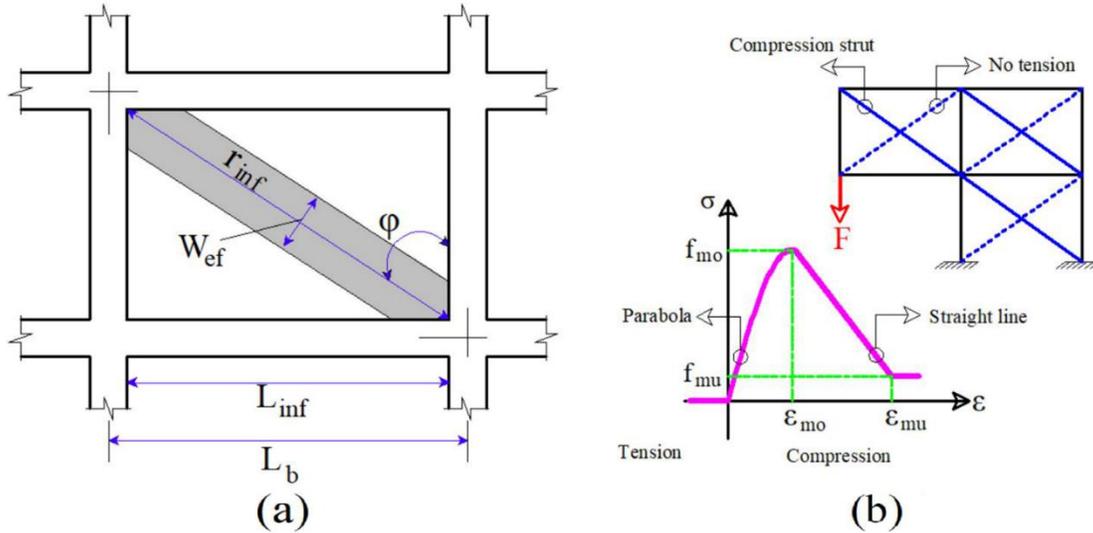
Detailing of equivalent strut compression for modeling of infill wall (a) Schematic of equivalent strut compression in an RC frame (b) Material that has been used in infill modeling.
